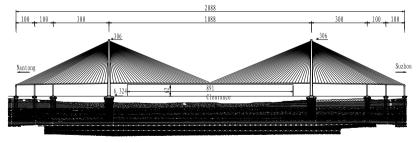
Span Arrangement of the Main Bridge (Unit: m)
